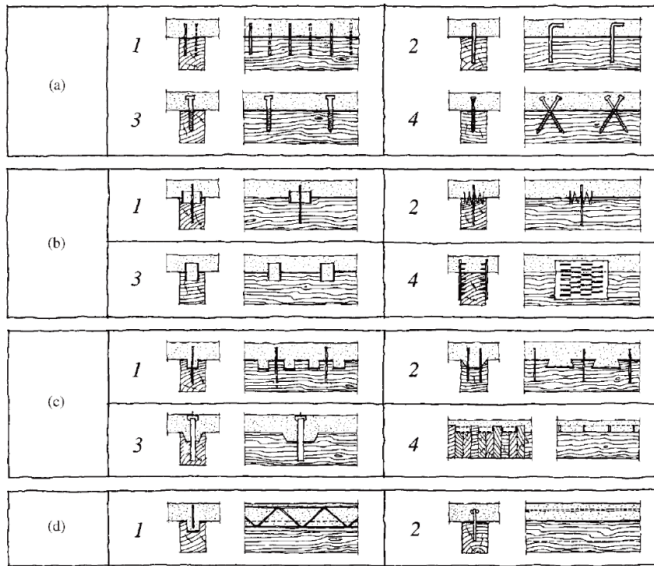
Examples of timber-concrete shear connections (a1) nails; (a2) reinforced concrete steel bars, glued; (a3) screws; (a4) inclined crossed-screws; (b1) split rings; (b2) toothed plates; (b3) steel tubes; (b4) steel punched metal plates; (c1) round holes in timber and fasteners preventing uplift; (c2) square indentation and fasteners; (c3) cup indentation and prestressed steel bars; (c4) nailed timber planks deck and steel shear plates slotted through the deeper planks, (d1) steel lattice glued to timber, (d2) steel plate glued to timber – (Ceccotti, 2002)
